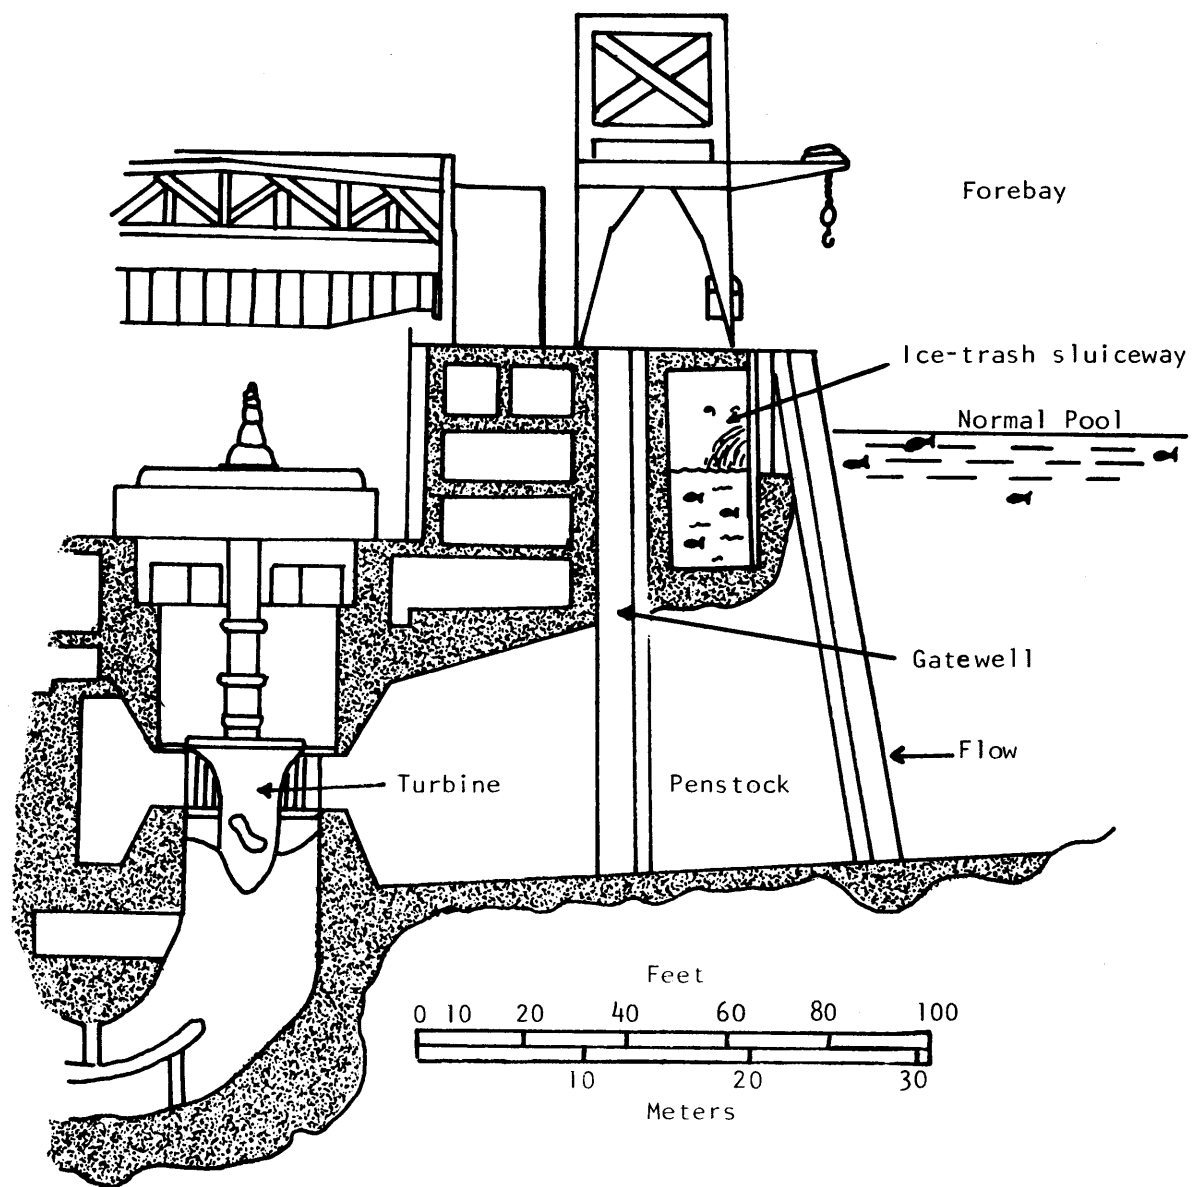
Cross section of a Columbia River dam with a sluiceway.
